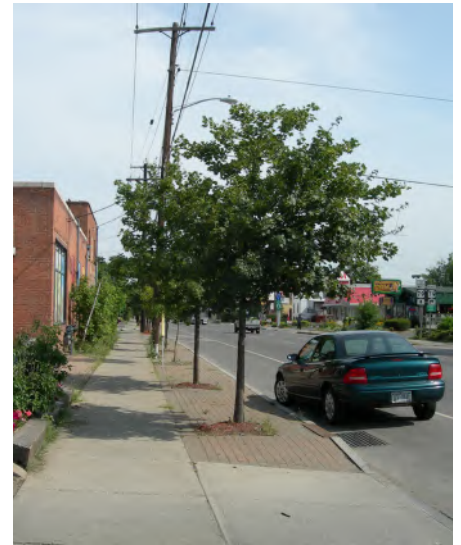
Concrete unit pavers on a coarse sand setting bed on top of a continuous trench of CU-Structural Soil™ in Ithaca, NY
